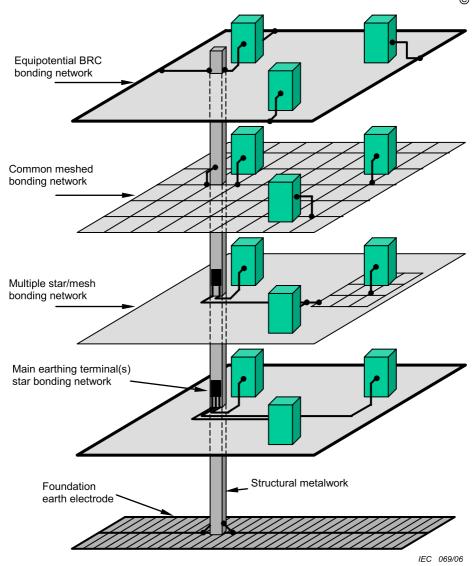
R16 – Example of equipotential bonding networks in structures without lightning protection systems
